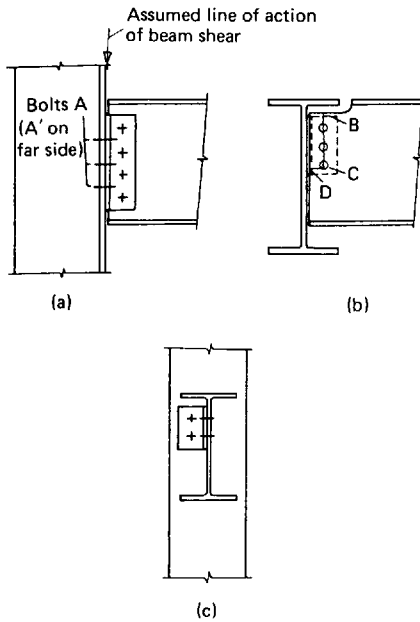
'Simple' beam-to-column and beam-to-beam connections. (a) Conventional beam-to-column connection with double-web cleat; (b) beam-to-beam grillage connection with double-web cleats; (c) single-web cleat connection
